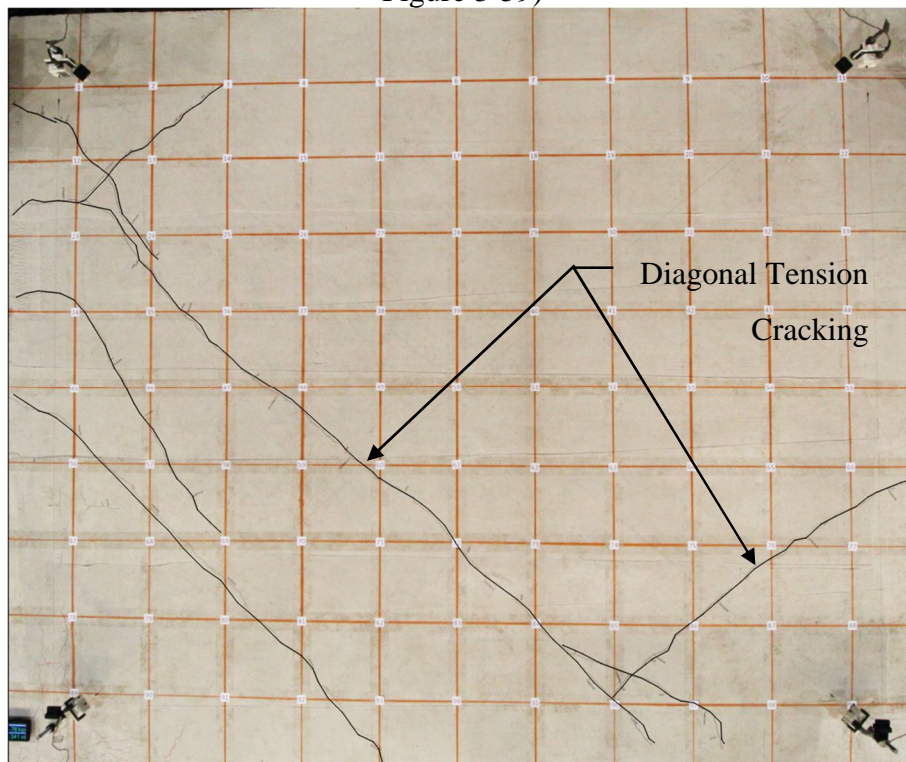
Crack Distribution of Specimen 3/6.25-4-L-RS-DT First Occurrence of Diagonal Tension Cracking (Point B in Figure 3-59)
